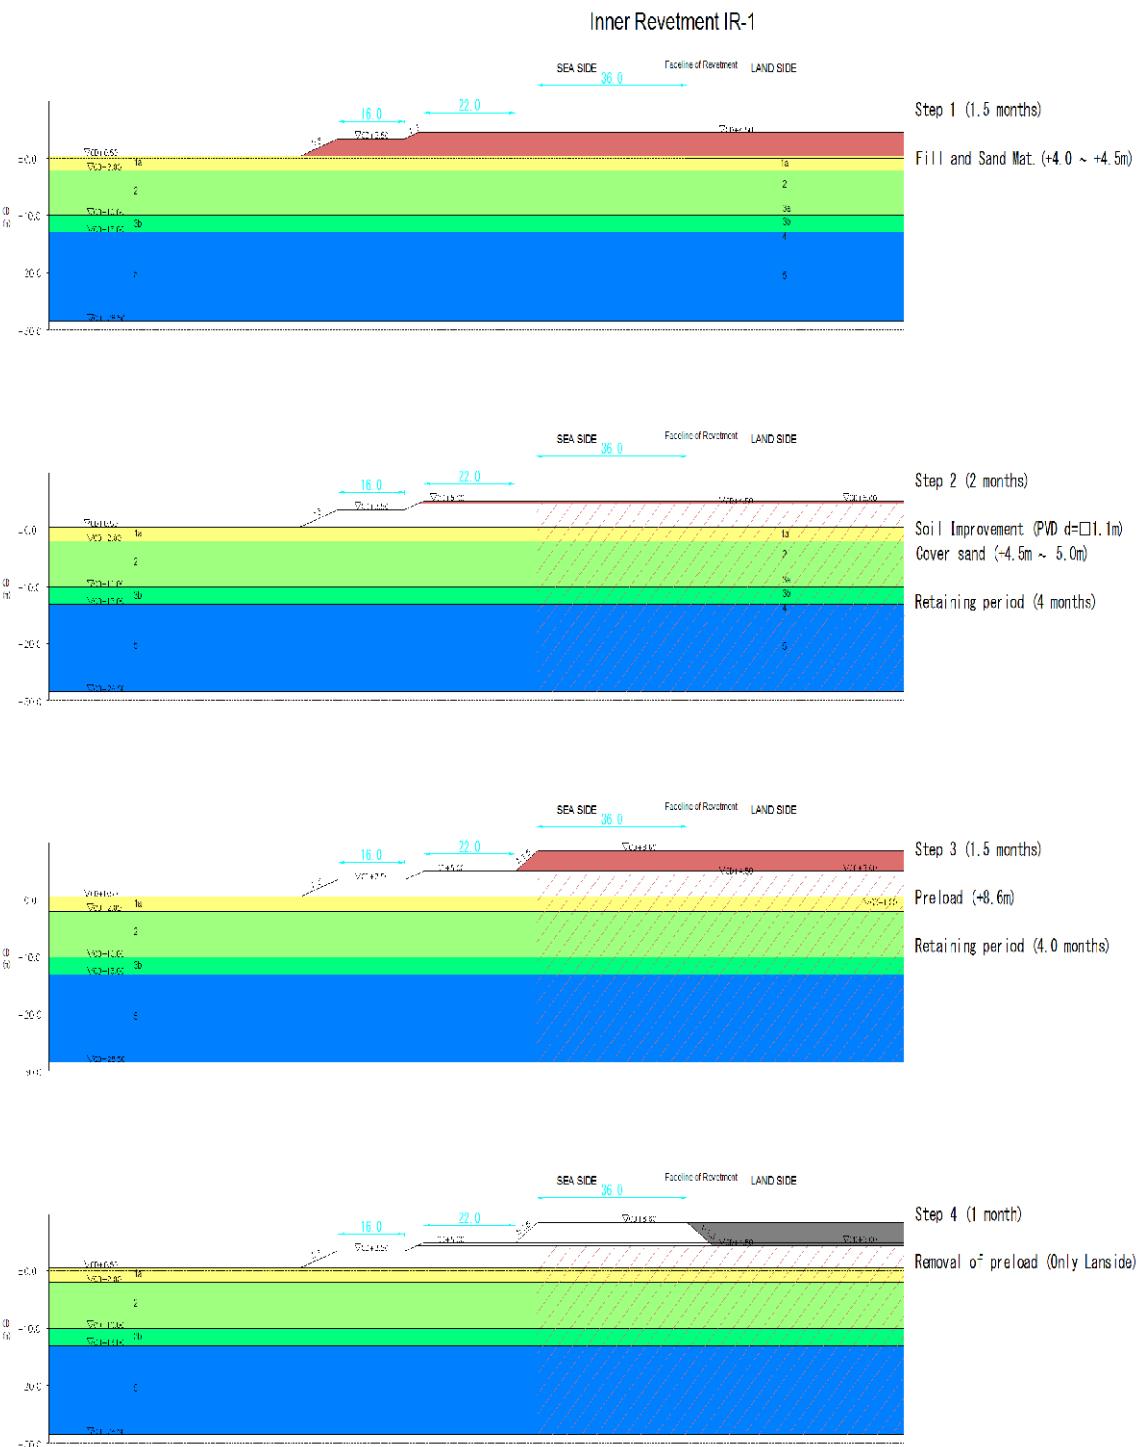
Subsoil Improvement Procedure with PVD+Preload at Section IR-1 (Inner Revetment) (1/2)
